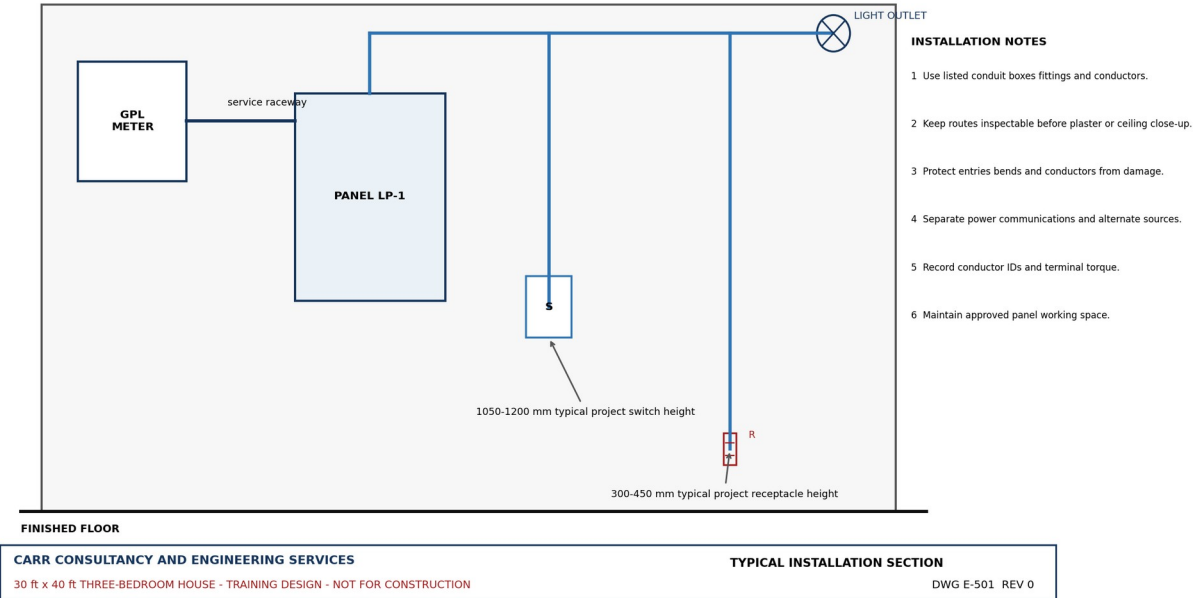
Original CARR diagram for practical installation from set out to termination.
